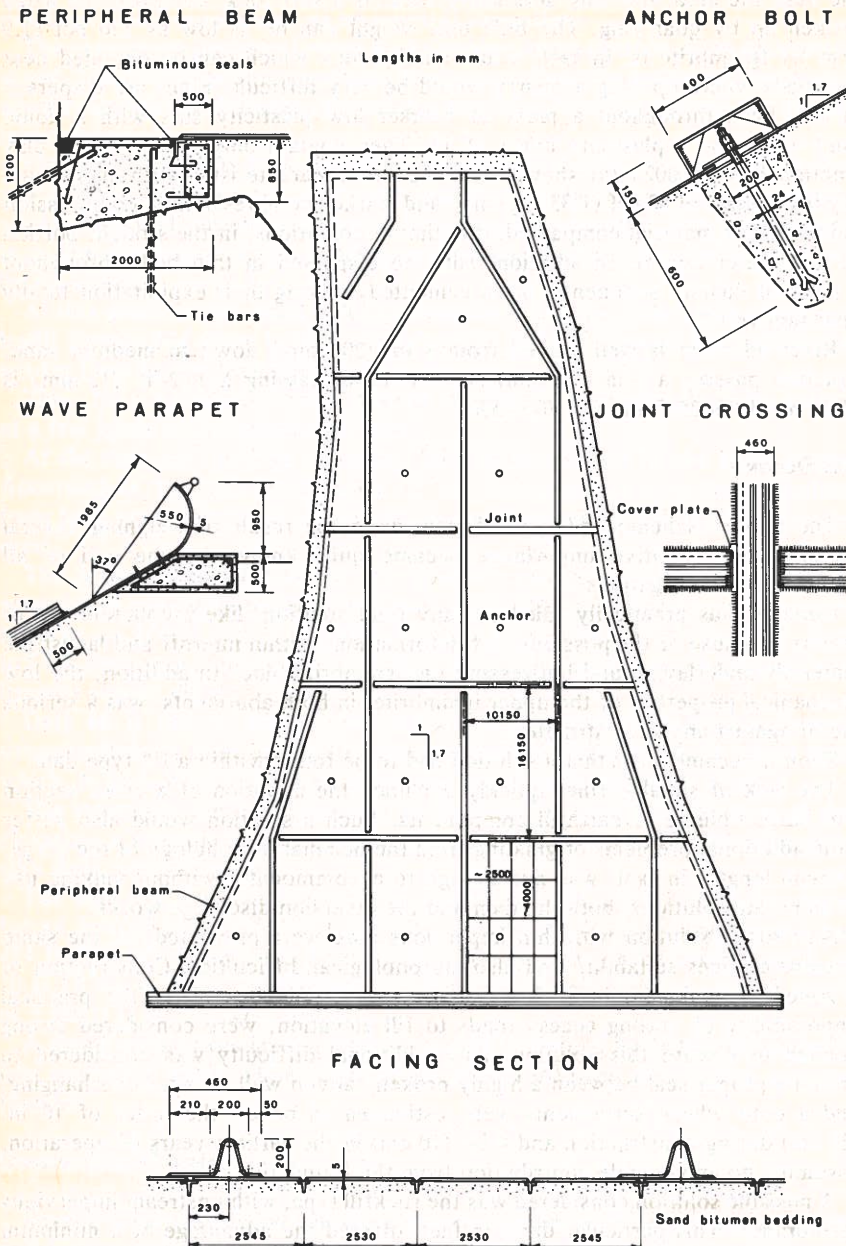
Aguada Blanca Dam—Plan of Metal Facing Showing Joint Pattern and Design Details
